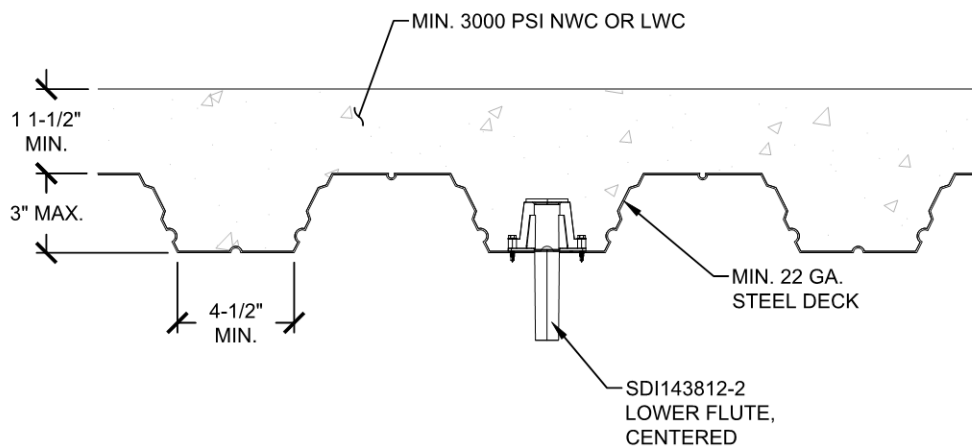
B - SDI-2 AND PRSDI3812-2 INSERTS INSTALLATION IN THE SOFFIT OF CONCRETE FILLED METAL DECK FLOOR AND ROOF ASSEMBLIES OVER LOWER FLUTE (B-DECK) - ELEVATED^{1,2,3}
